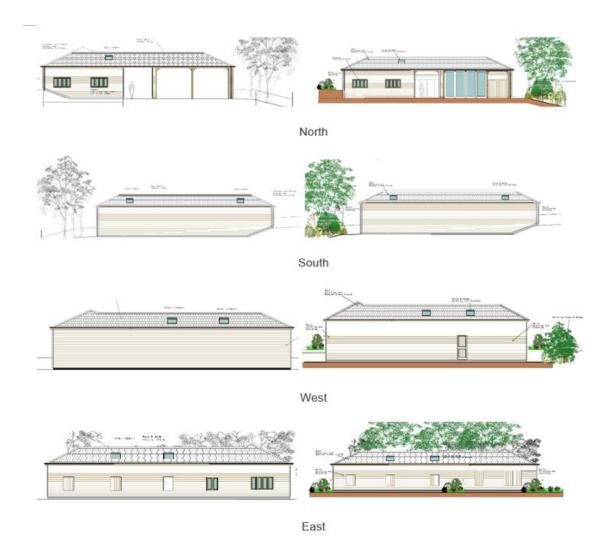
Existing Elevations (left) and Proposed Elevations (right) comparision
